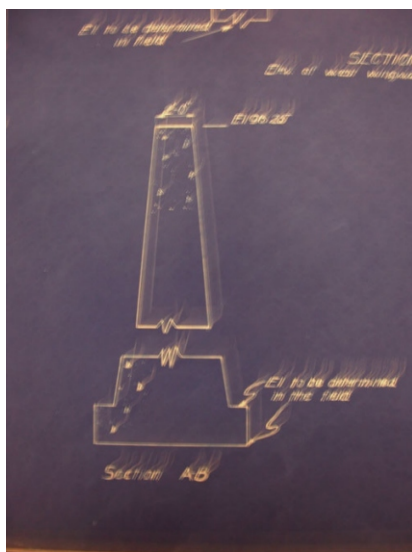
Detail of Vermeule's original 1927 plan for a cement spillway similar to three-pronged weir at Furnace Pond, in plan and profile (*Digital photo by author, courtesy of NJ State Archives, Box 37, item Number 1, Plans for work on Section 54-55*).
